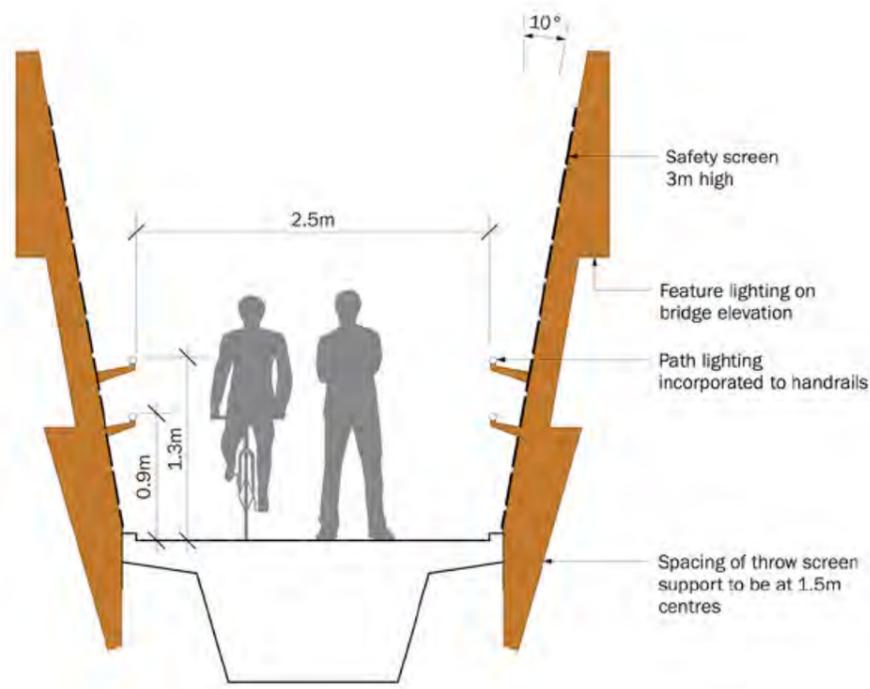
Section through proposed Northfields pedestrian overpass extension - BR04 (Scale 1:200)
